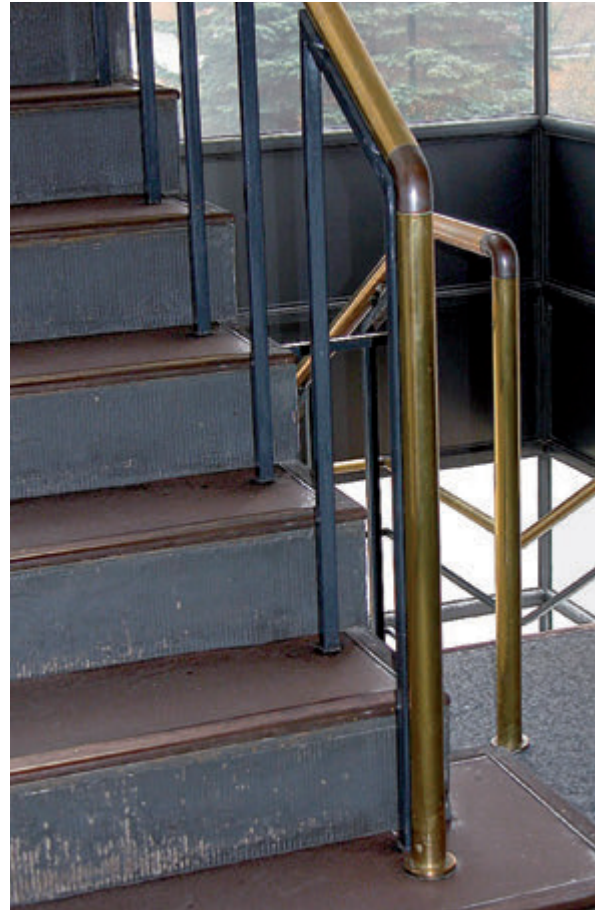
Main building, staircase, handrails 1st floor (2002)
